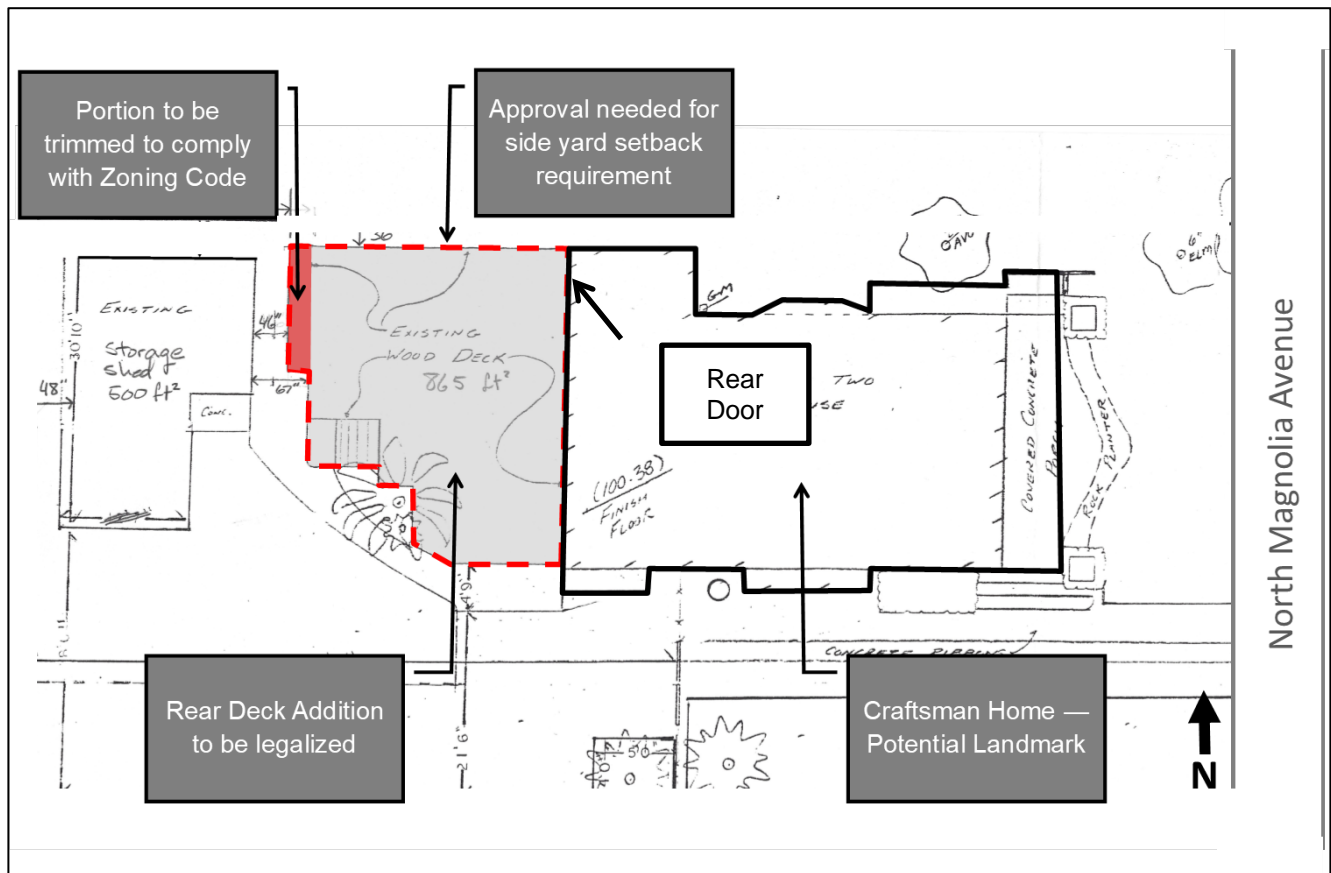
Current Site Plan of 141 N. Magnolia Avenue. The applicant will be making some modifications to the rear deck in order to comply with current Zoning requirements.
